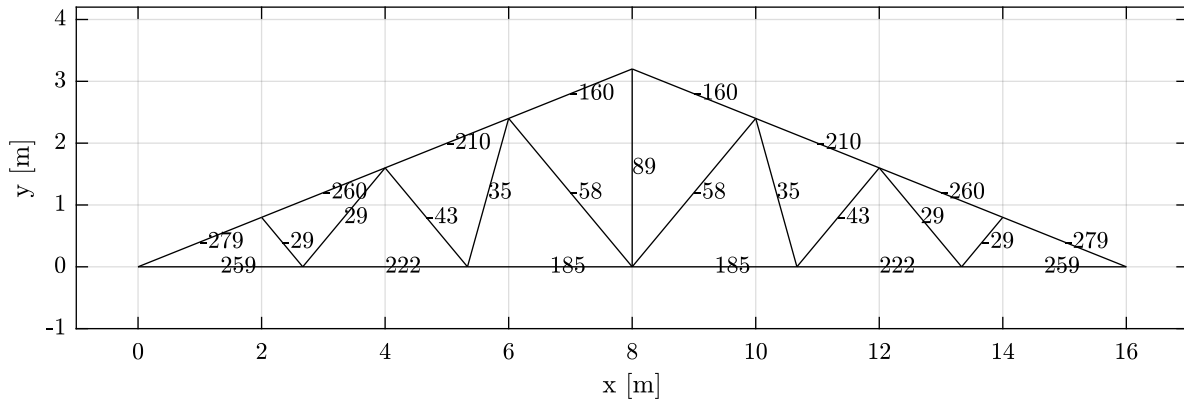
Normal forces in [kN] of the duopitch roof truss with raised eaves for ULS loading conditions.
